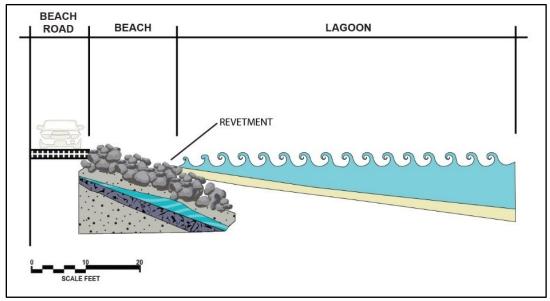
Rock revetment designed to prevent undermining of Beach Road.
